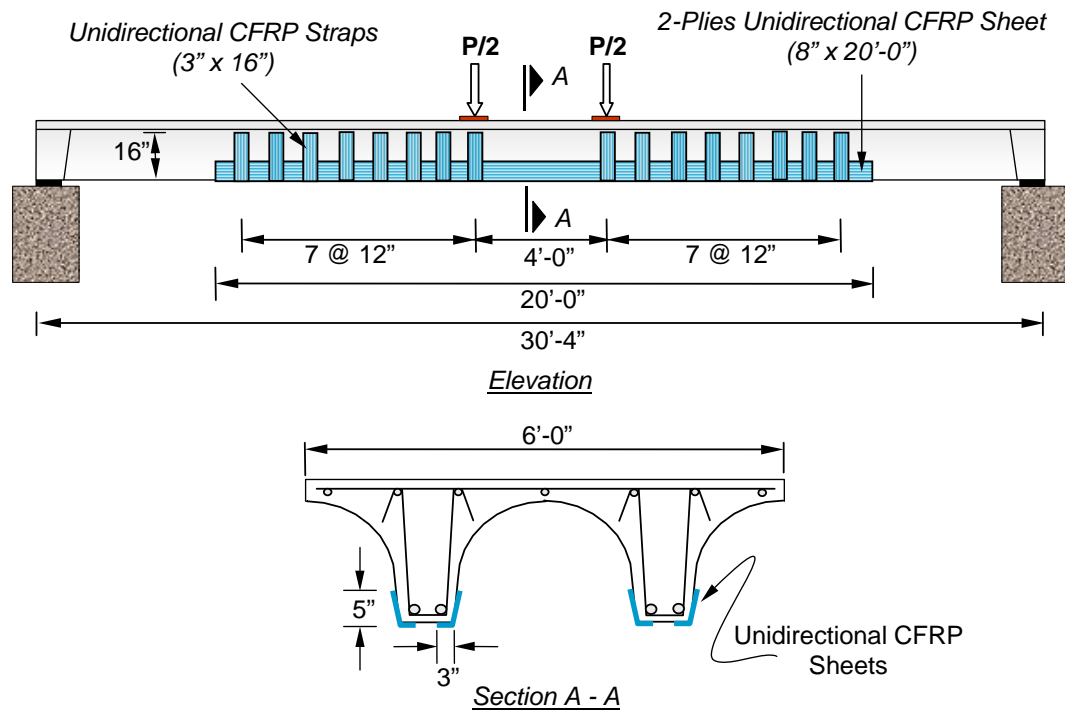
CFRP Strengthening Details for Specimen J-2
